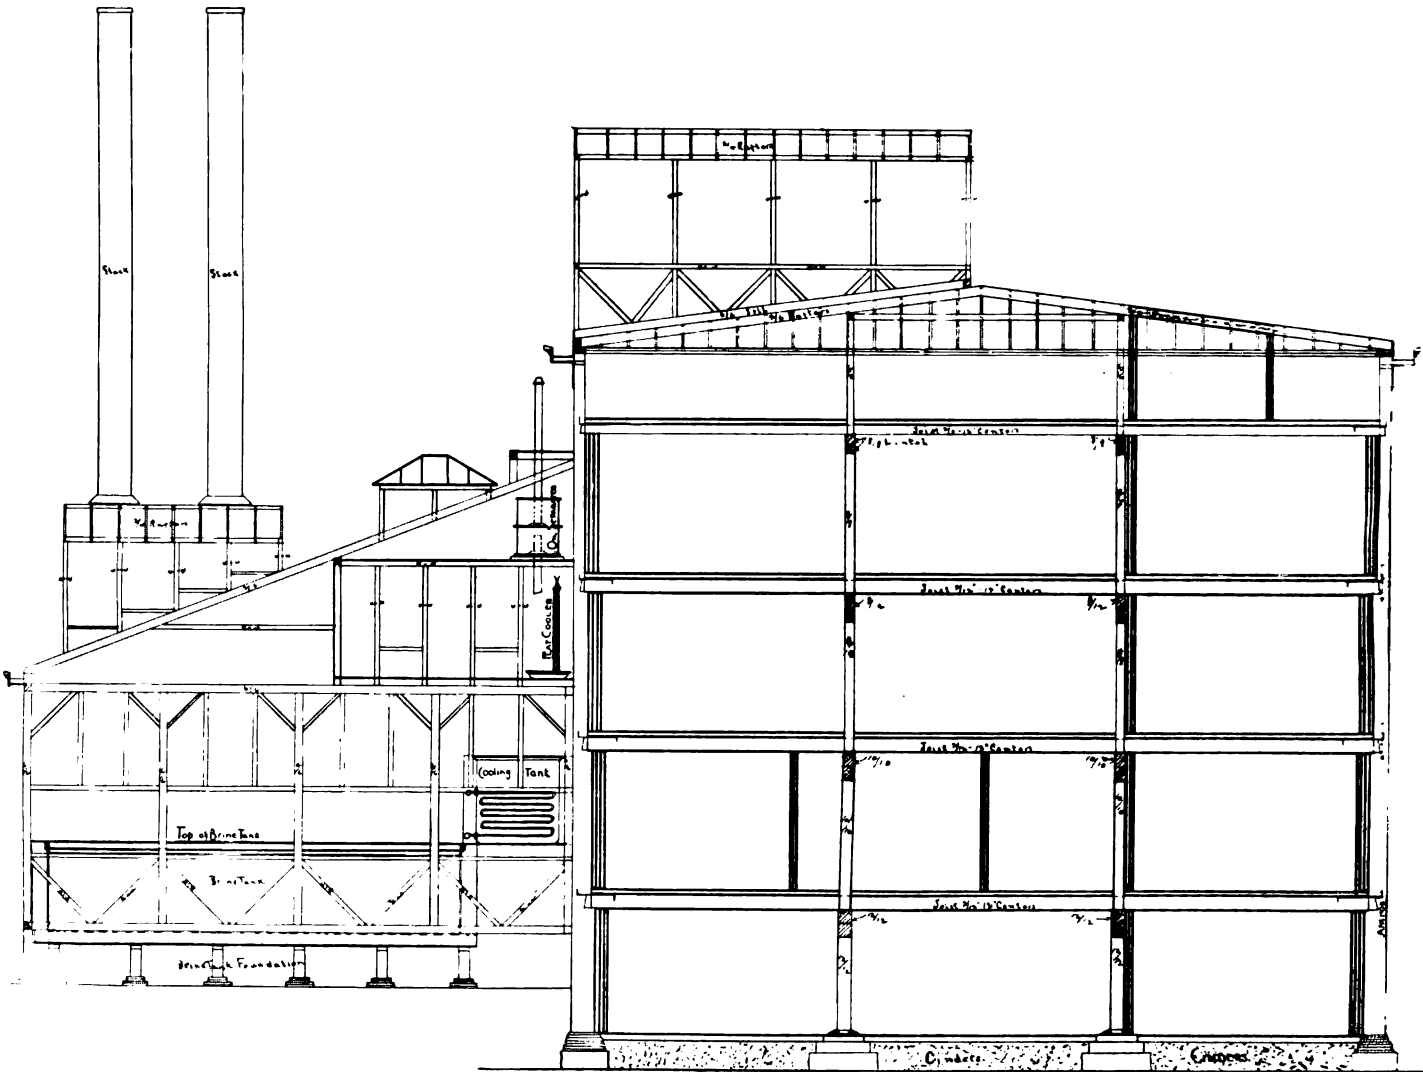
CROSS-SECTION, ICE PLANT AND COLD STORAGE WAREHOUSE—TOLEDO COLD STORAGE CO., TOLEDO, OHIO.
